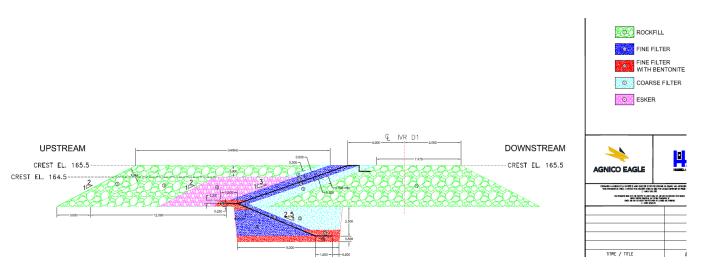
Typical Cross-Section of IVR Dike D-1 (0+080 to 0+320)
